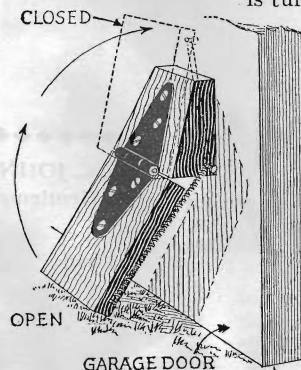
A simple door check made with hinged blocks of wood and a small spring.
